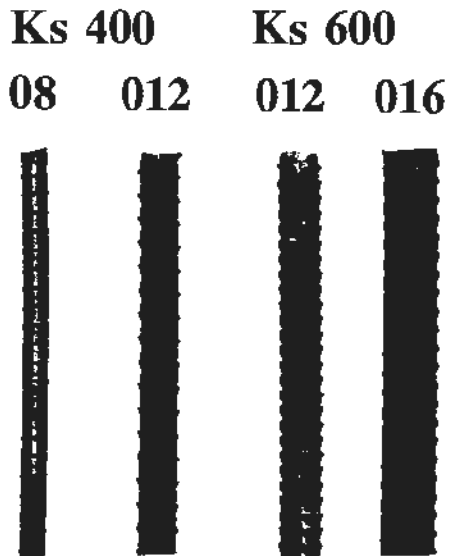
Swedish Ks 400 and Ks 600 high bond reinforcement.
